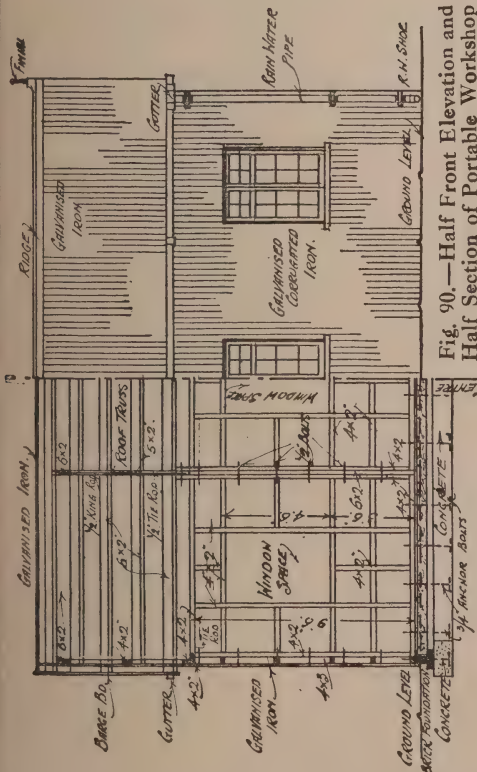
Half Front Elevation and Half Section of Portable Workshop
